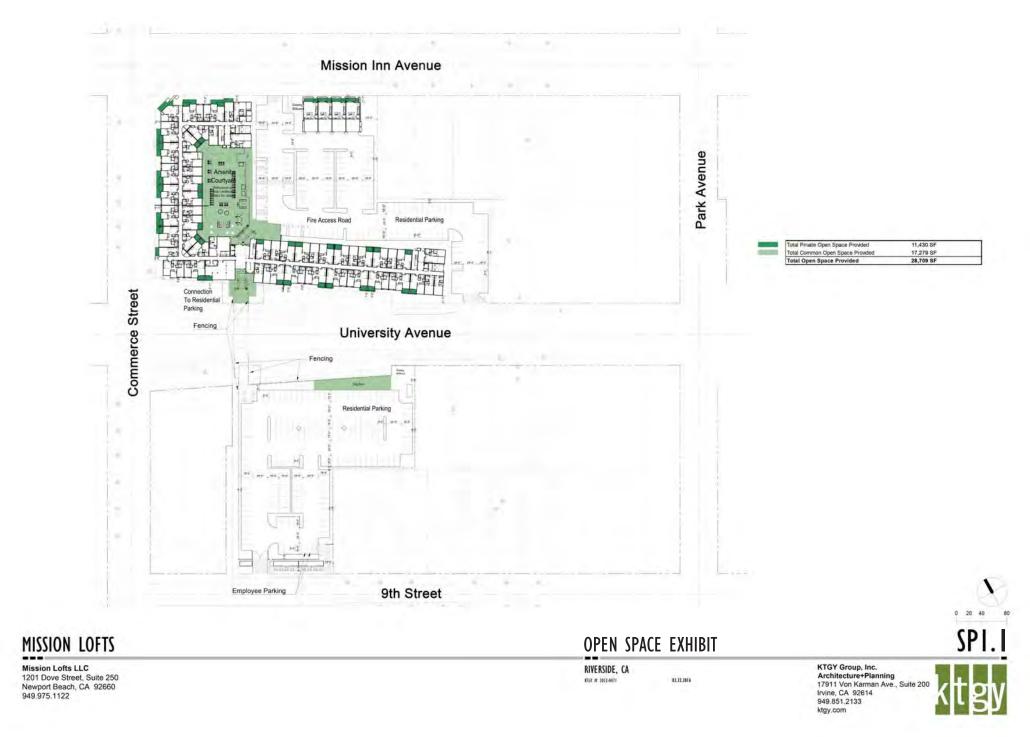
P14-0045 - P14-0048, P14-0953 & P14-0954, Project Plans - Open Space Plan
